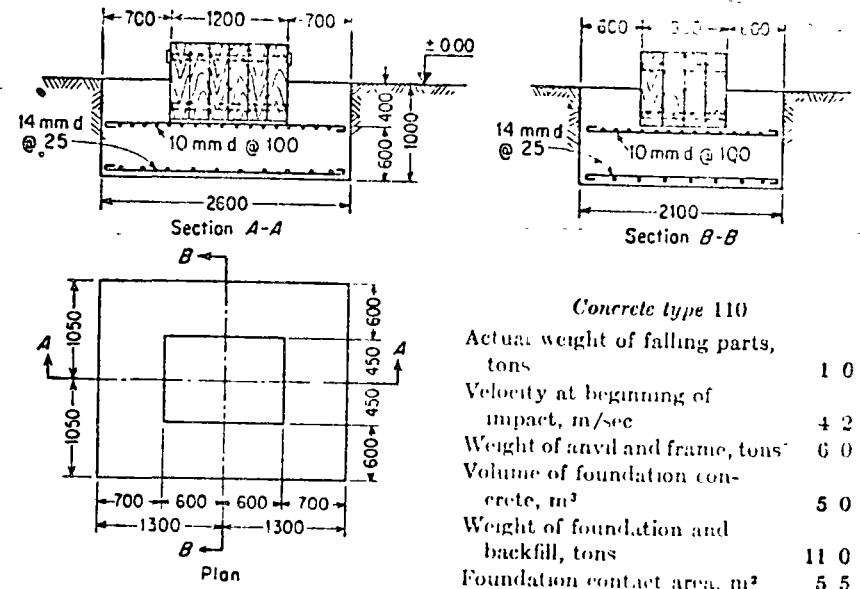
Foundation for 10-ton free-falling cable hammer
